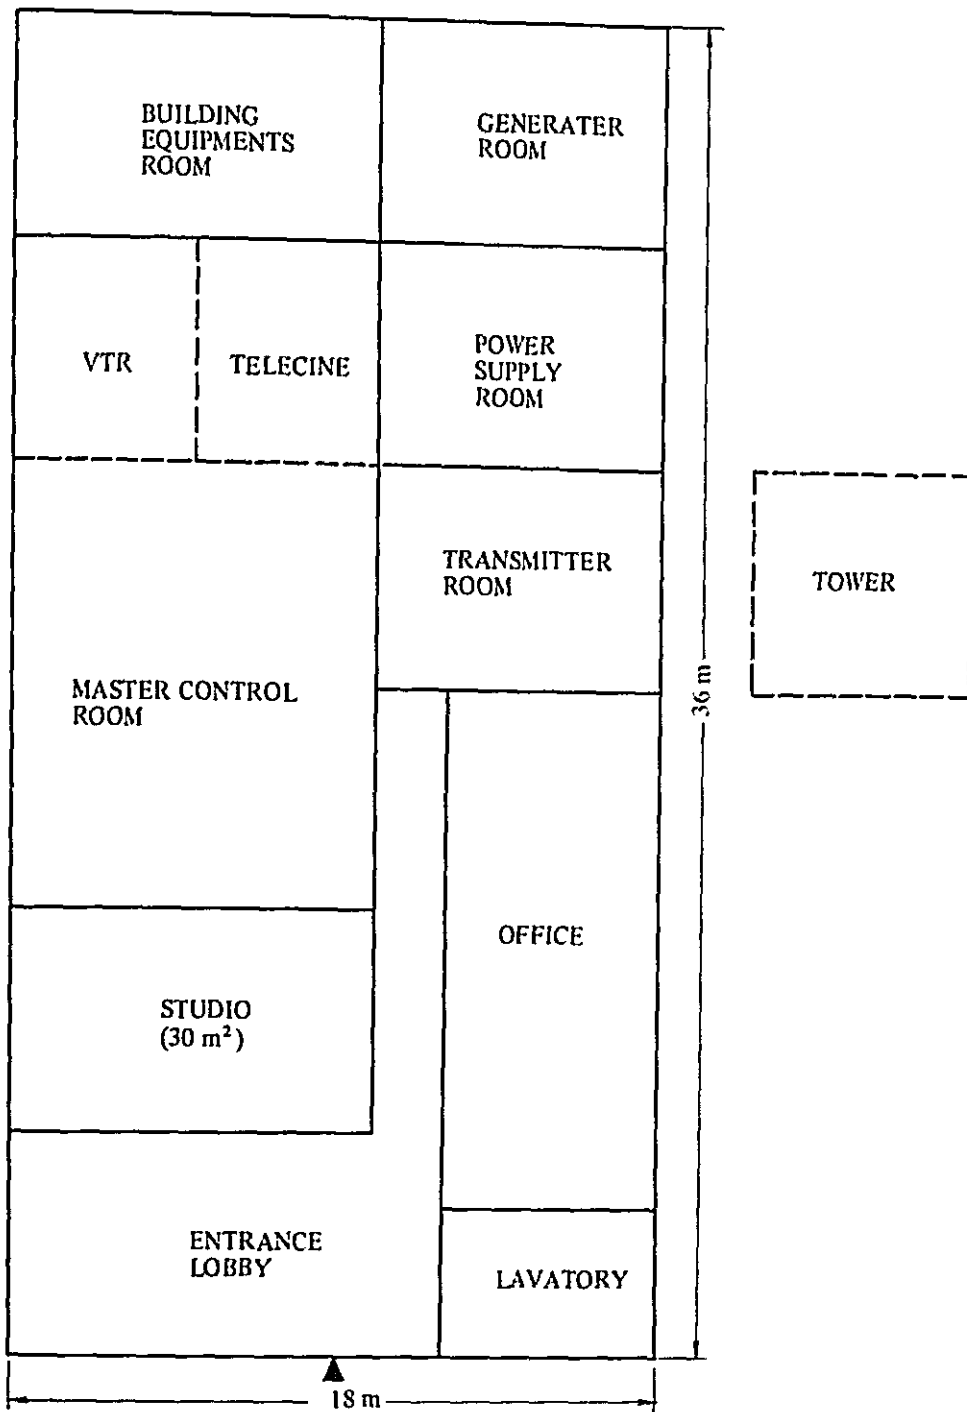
Floor Layout of General Region Studio Building (An Example)
